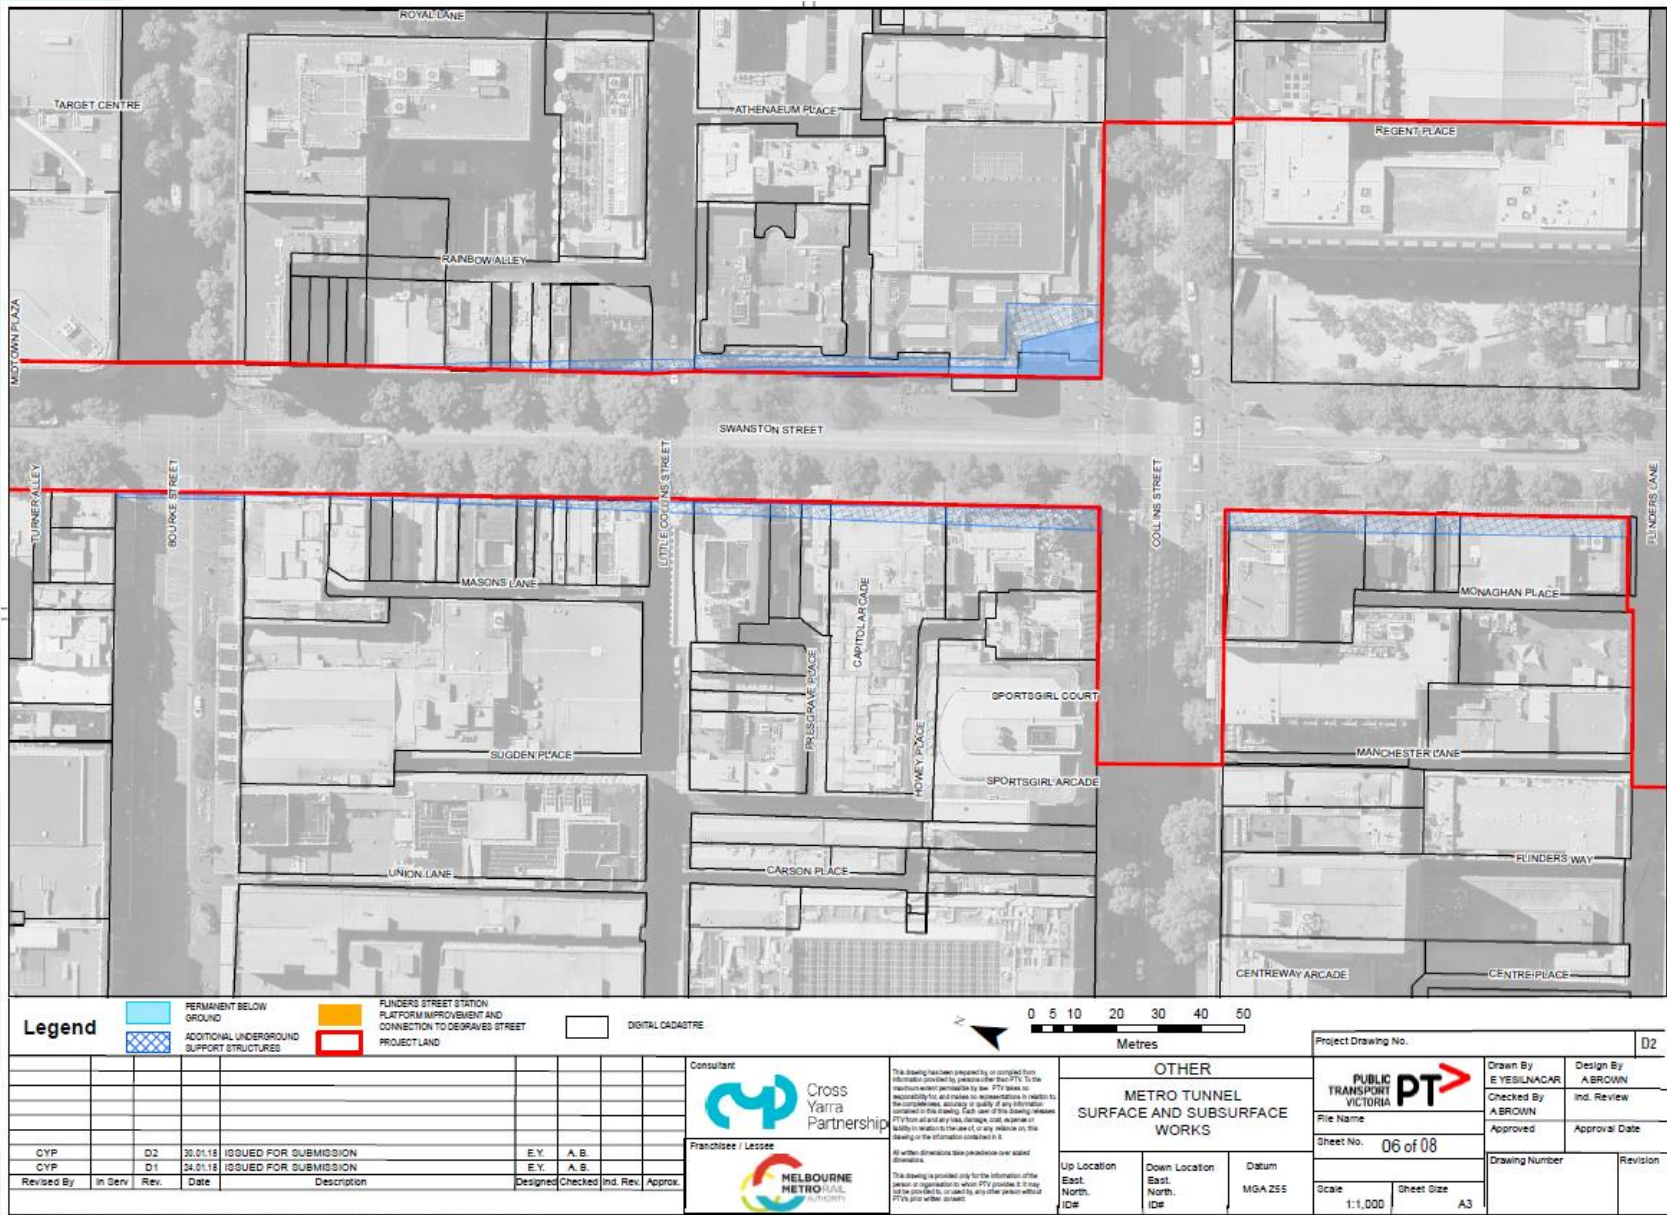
ADDITIONAL PROJECT LAND REQUIRED FOR UNDERGROUND SUPPORT STRUCTURES AND TUNNEL ALIGNMENT AT CBD SOUTH STATION
